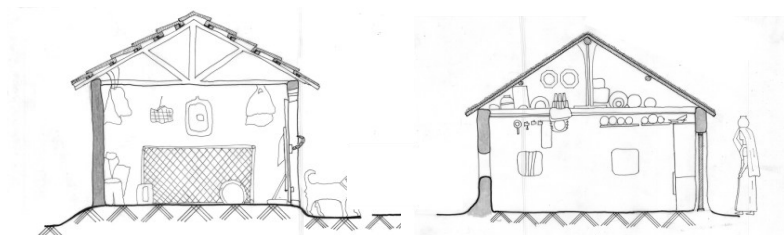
Wall section of houses in Zararwadi in Hodko, Kutch (created by the Author)
